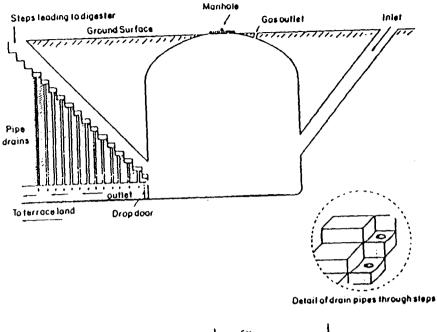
contd. (b) Design for an excavated biogas unit with a masonry built tank (Sichuan).¹⁷
